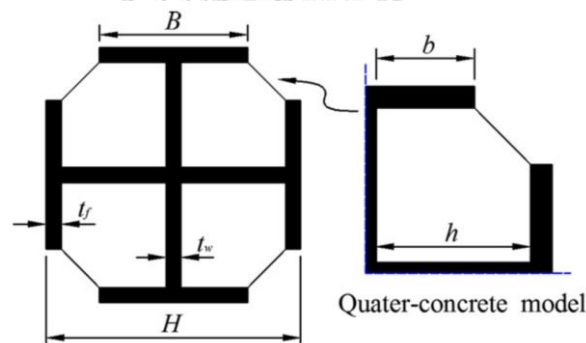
Cross-section of PEC columns with cross-shape structural steel (Chen and Wu, 2017).
